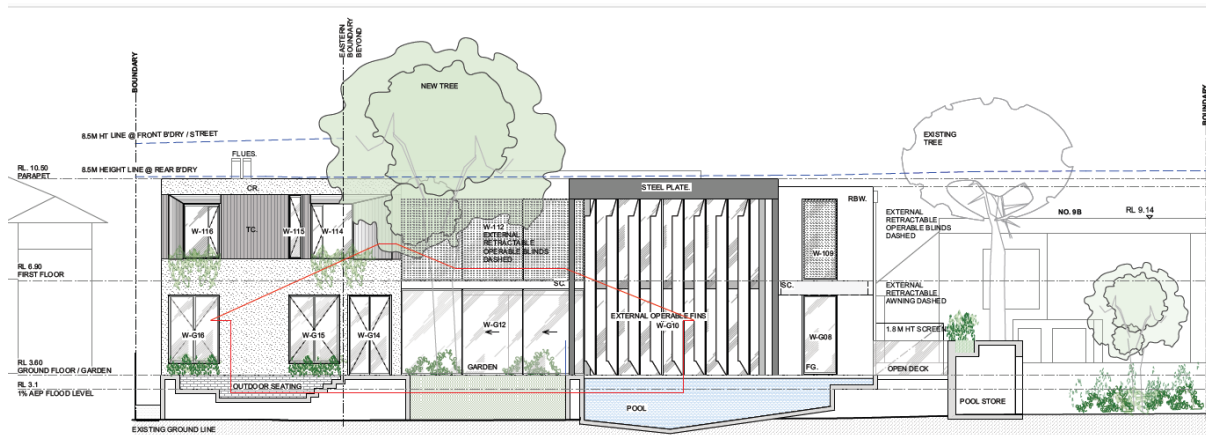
Proposed west elevation. The footprint of the existing dwelling is outlined in red.
